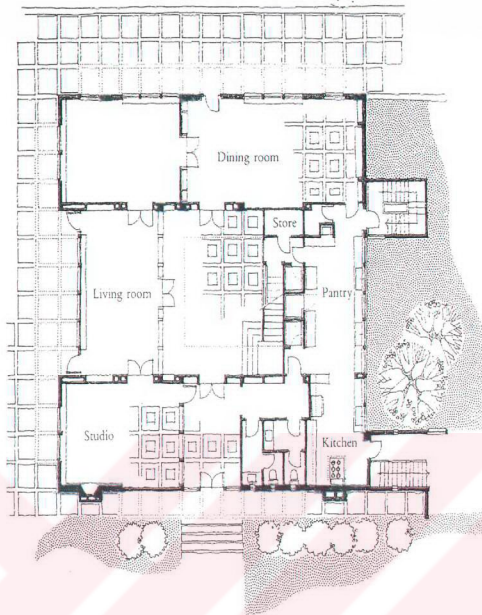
Dutch Embassy Residence –ground floor plan. Source: Bozdoğan (1987).
